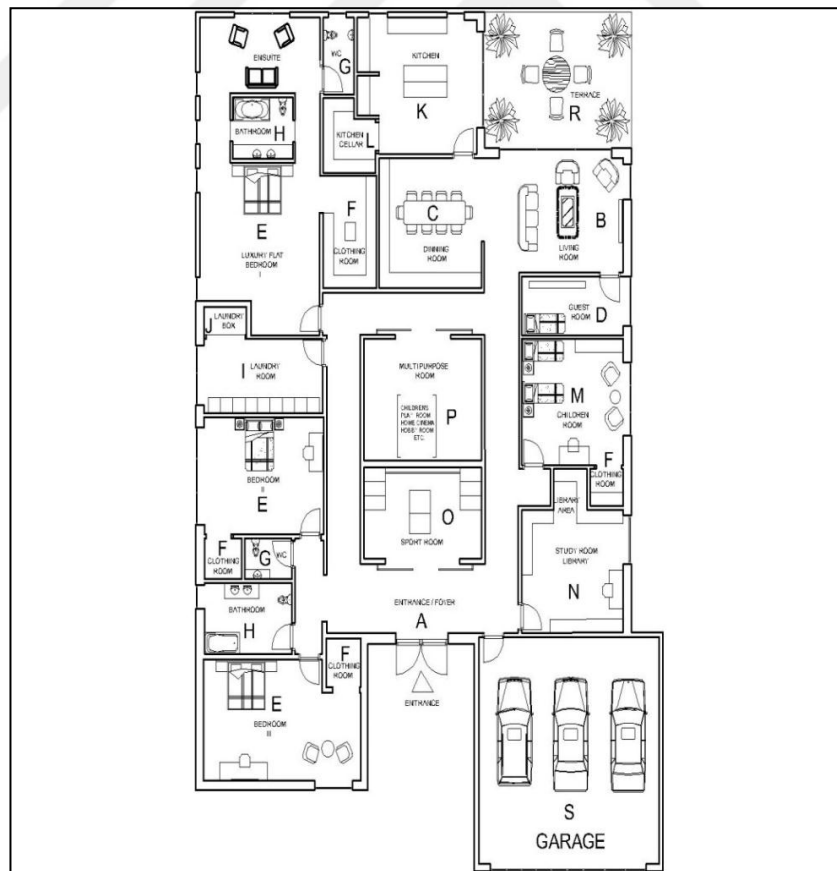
Current plan of single storey detached house type. Standard furnishing, designed by author.
